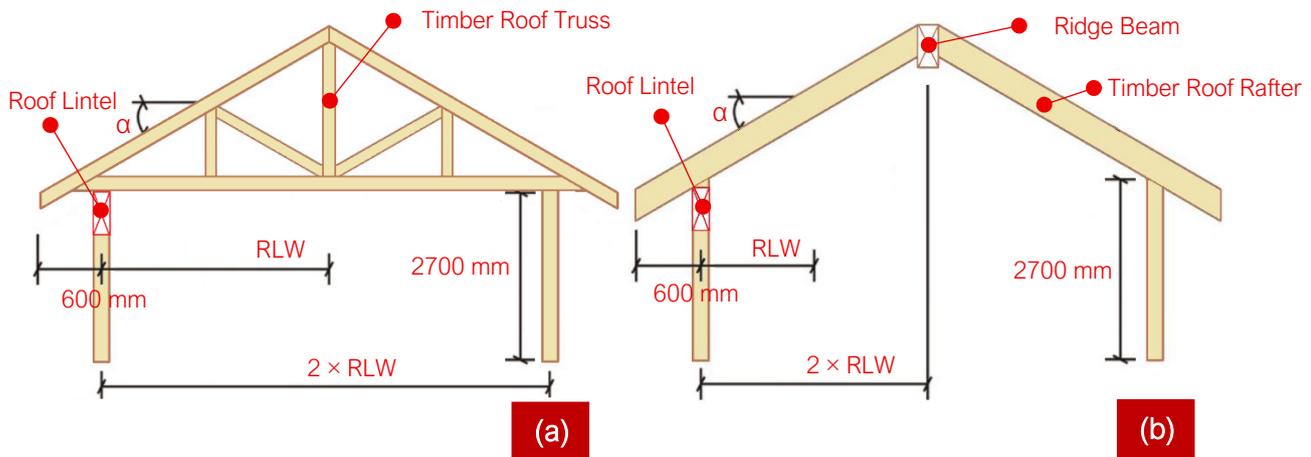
Red Stag Vertex₁₀ roof lintel beam; a) Timber roof truss, b) Timber roof rafter.
